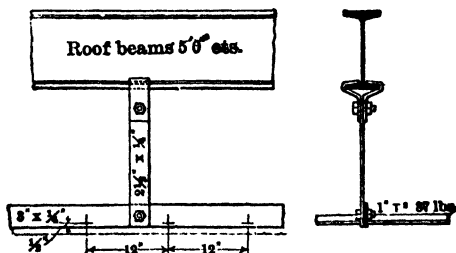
Suspended Ceiling. Details of Two-Bar System
